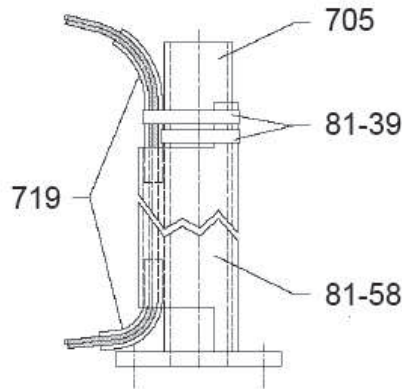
Routing the power cable with cable conduit along the vent pipe
